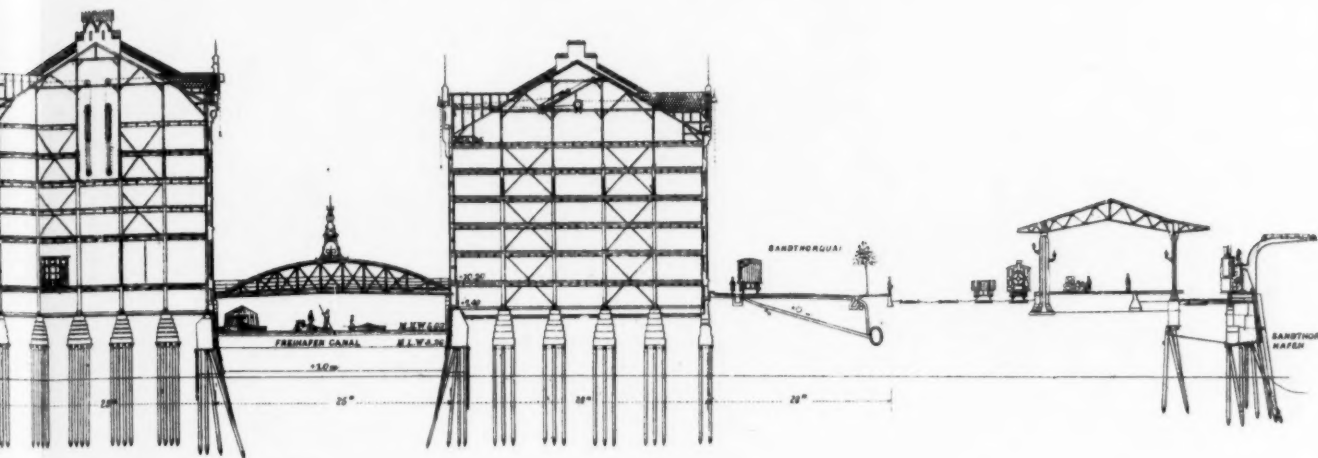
SECTION OF HAMBURG WAREHOUSE
